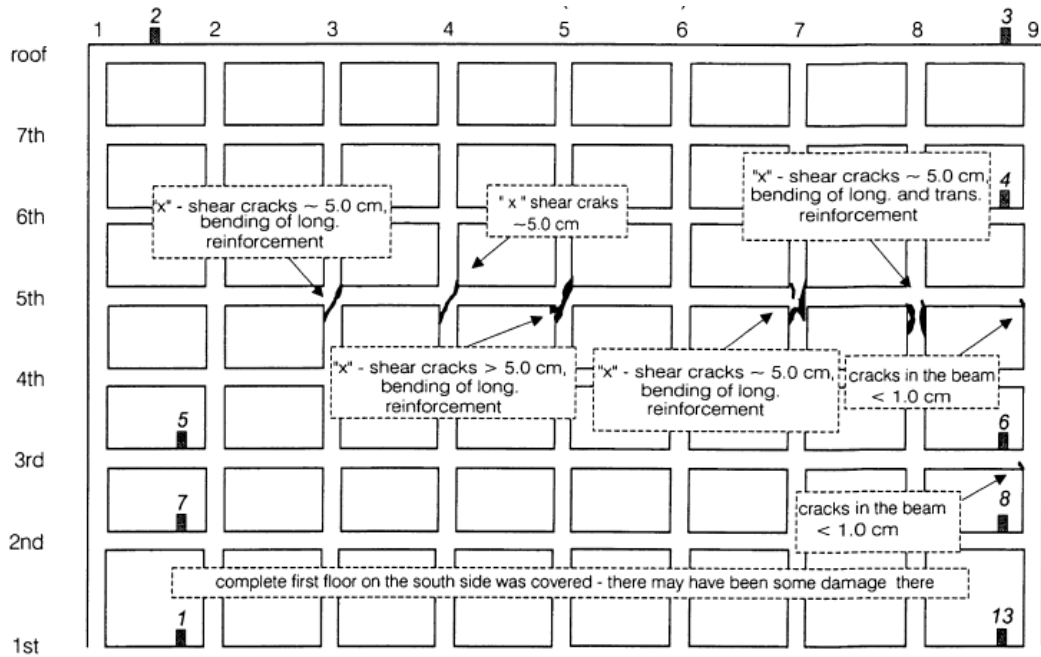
Observed structural damages on building after Northridge Earthquake – south view [120].
